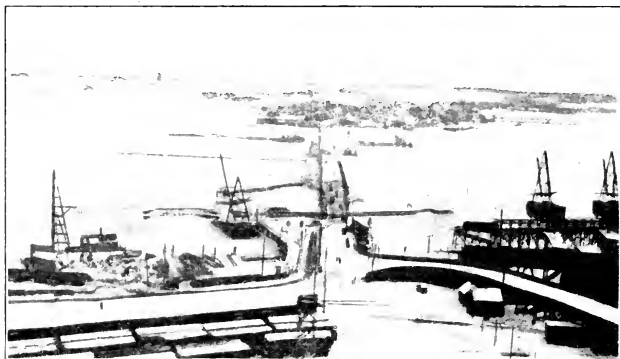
OLD BRIDGE AND TEMPORARY STRUCTURE.
